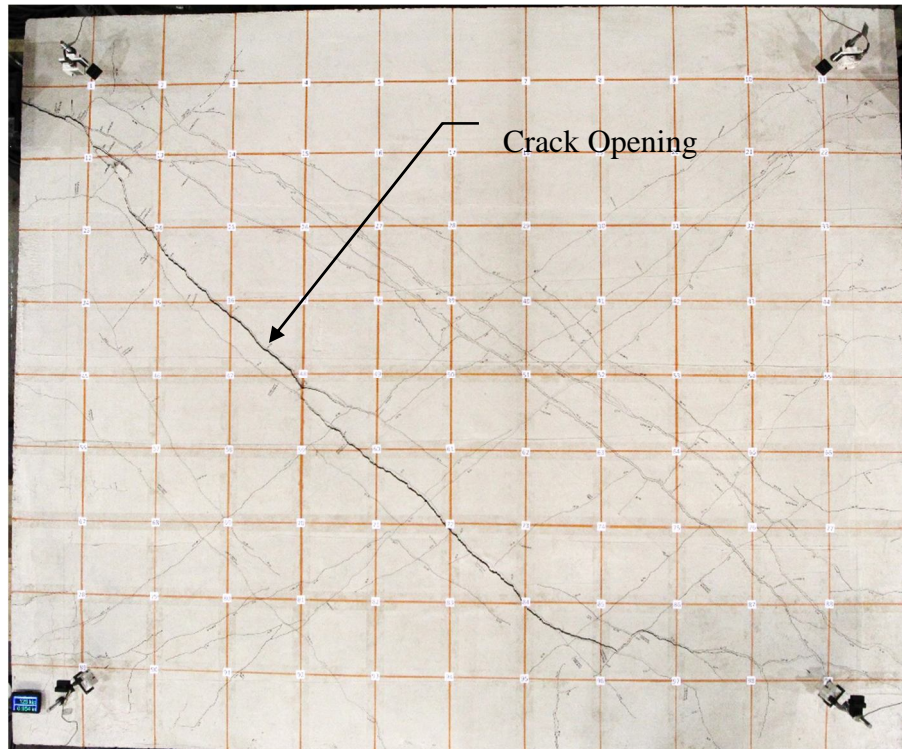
Crack Distribution of Specimen 3/6.25-4-L-RS-DT: Crack Opening Post Peak (Point D in Figure 3-59)
